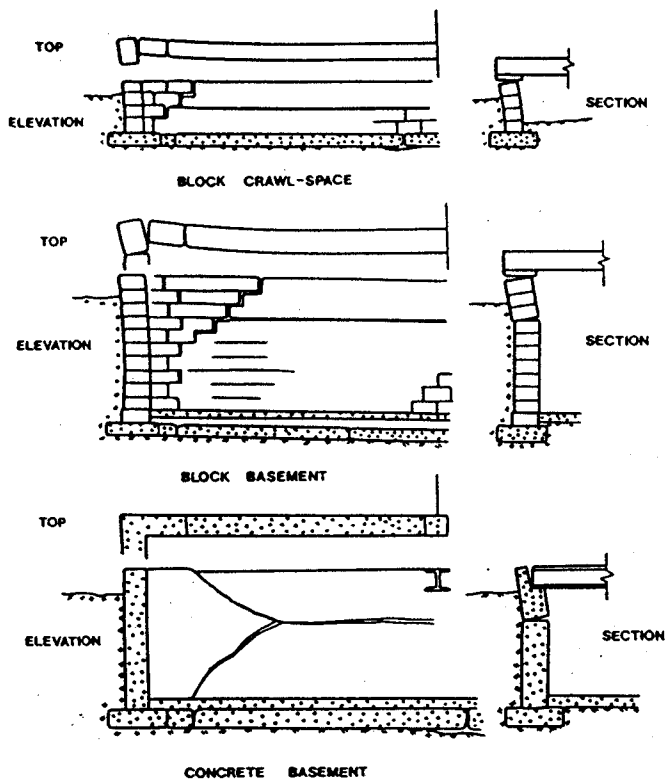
Major damage to masonry and concrete bearing walls in the compression zone (Marino and Mahar, 1984).
